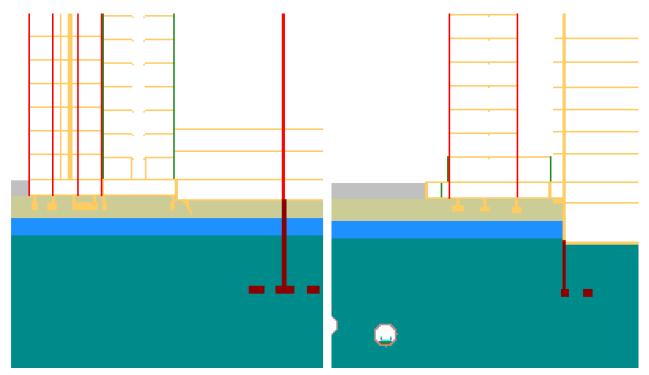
Cross Section through the Model: Left, North-South View; Right, East-West View.
